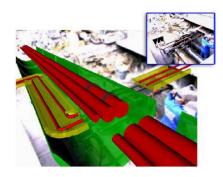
3D model of underground infrastructures superimposed on a construction site (source: [20]).
